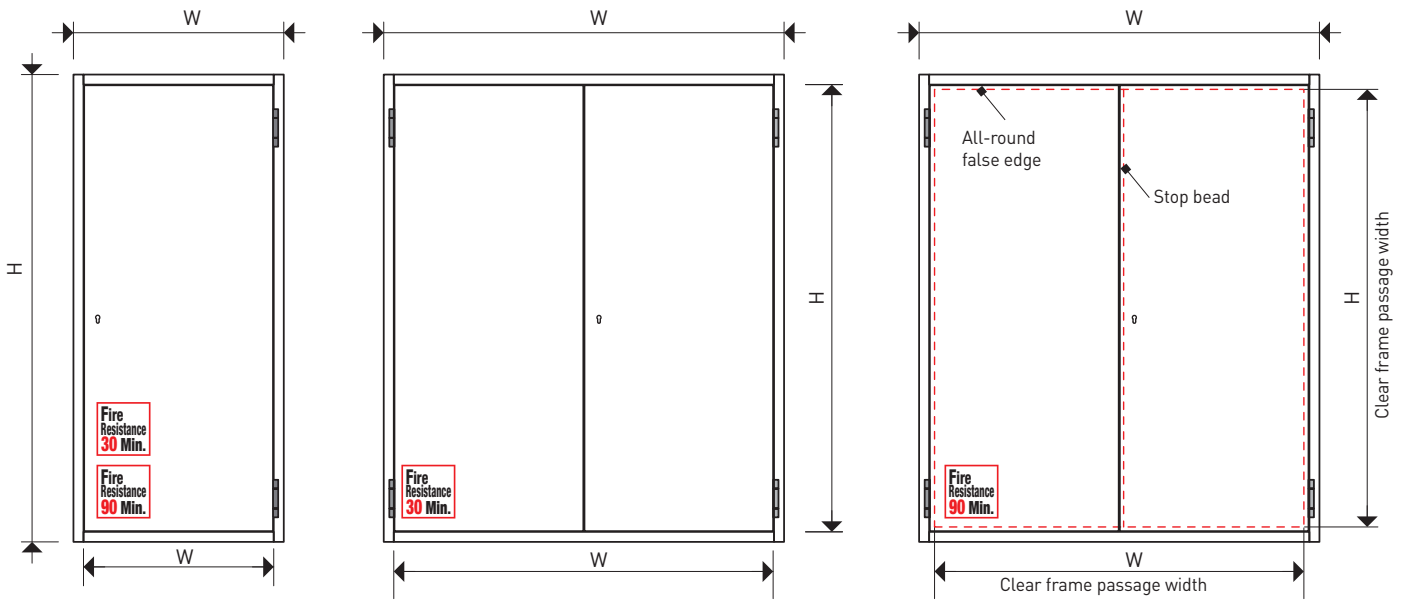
leaf PRIODOOR ETX fire resistant design with overlap
